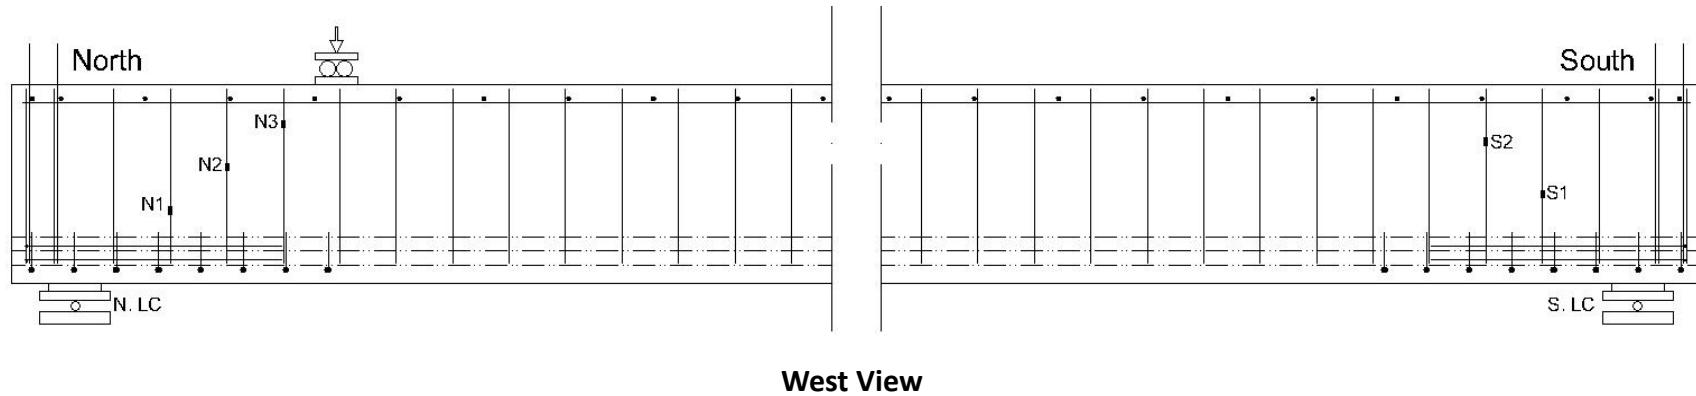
Layout of Strain Gauges on Transverse Reinforcement for Girder G2-North End Testing (Labib 2012)
